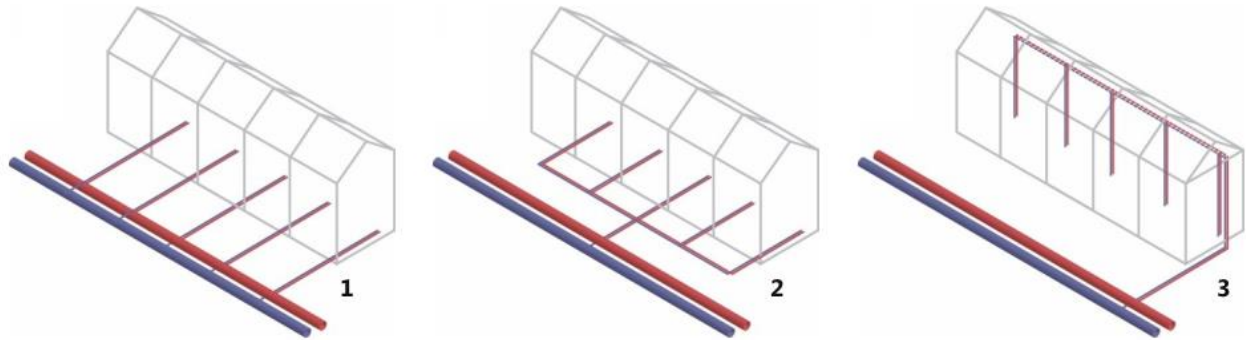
District heating connection strategy to street main (illustration for houses).
